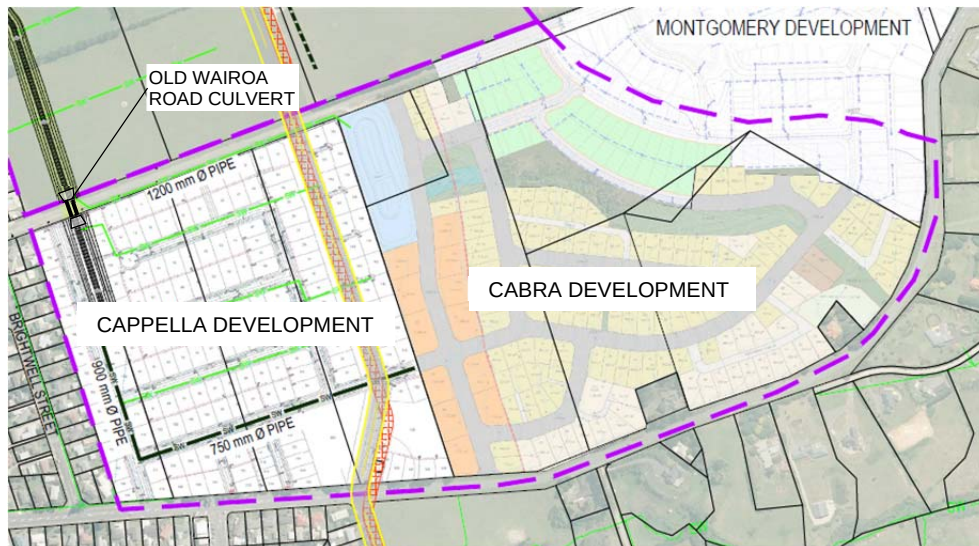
Old Wairoa Road Culvert location plan (Drawing 51-3217404-C310)
